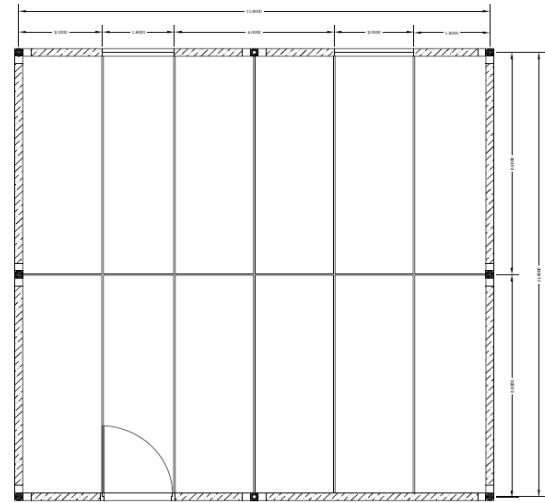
The ground floor plan of emergency shelter using sand boxes.
